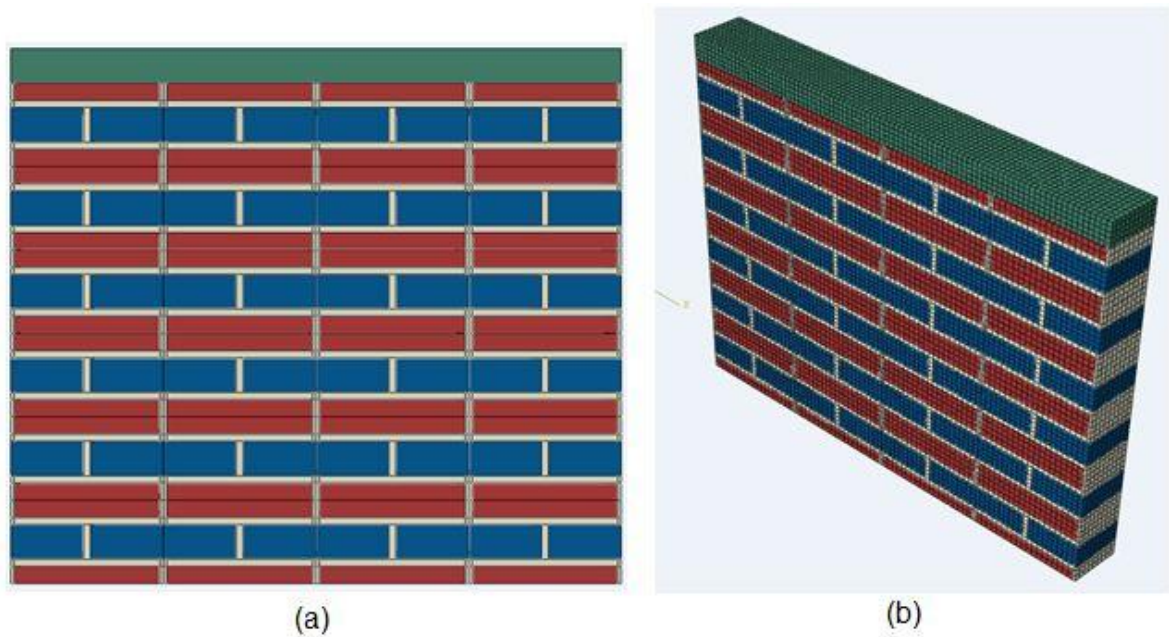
(a) masonry wall model (b) FE discretization of masonry
